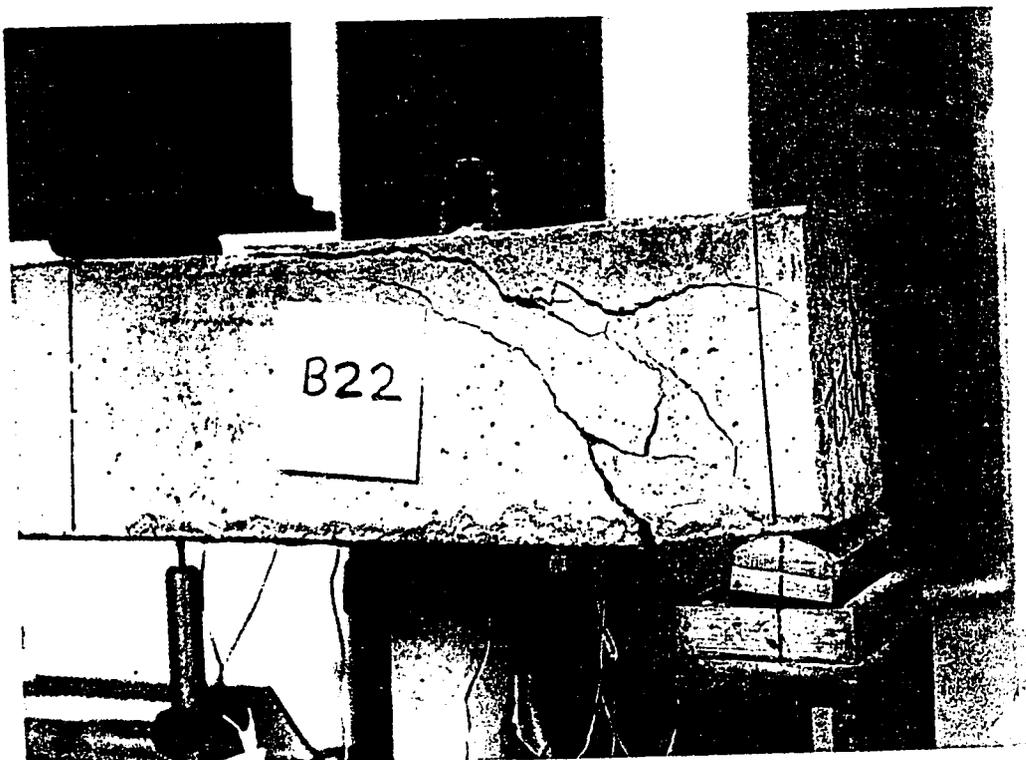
Failure Mode of Beam FPB2 (Diagonal Tension Crack Followed by Debonding of the Plate).
